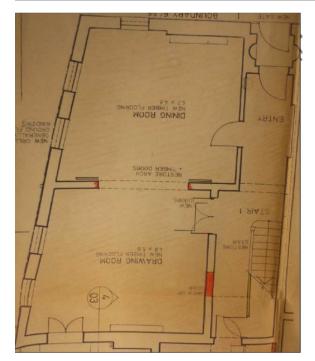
Ground floor of the main wing. The side entry, hall and stair are shown with two main rooms. A fireplace is also indicated on the front, Ballast Point Road wall (dining room).
